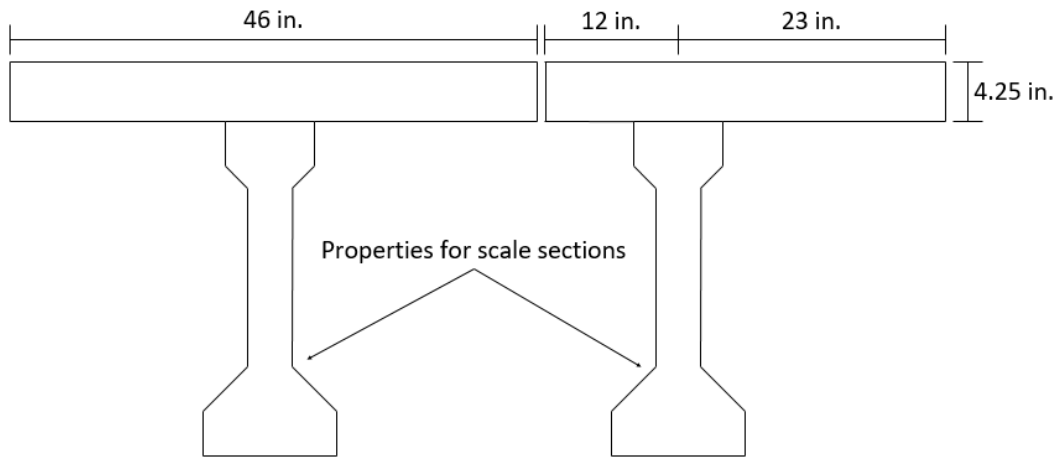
Longitudinal members used in grillage: interior girder (left), exterior girder (right)
